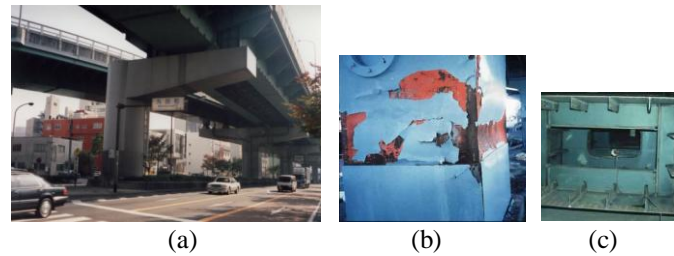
(a) Thin-walled Steel Tubular Columns with Circular (Front) and Rectangular Box (Rare) Sections Supporting Elevated Highway Bridge in Nagoya, Japan, (b) Damaged Steel Bridge Pier During Kobe Earthquake (January 17, 1995), (c) Stiffened Box Section
